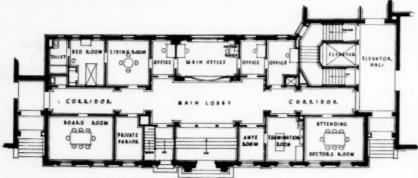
Samaritan Hospital-Administration building. First floor plan.
